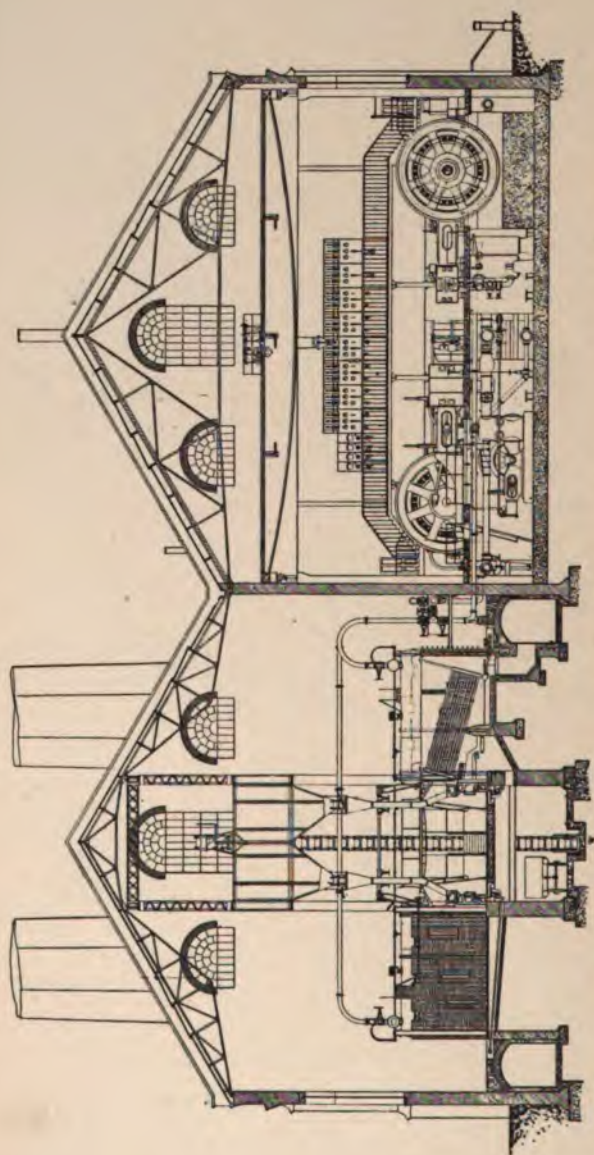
CENTRAL LONDON RAILWAY. SECTIONAL ELEVATION OF POWER STATION.
